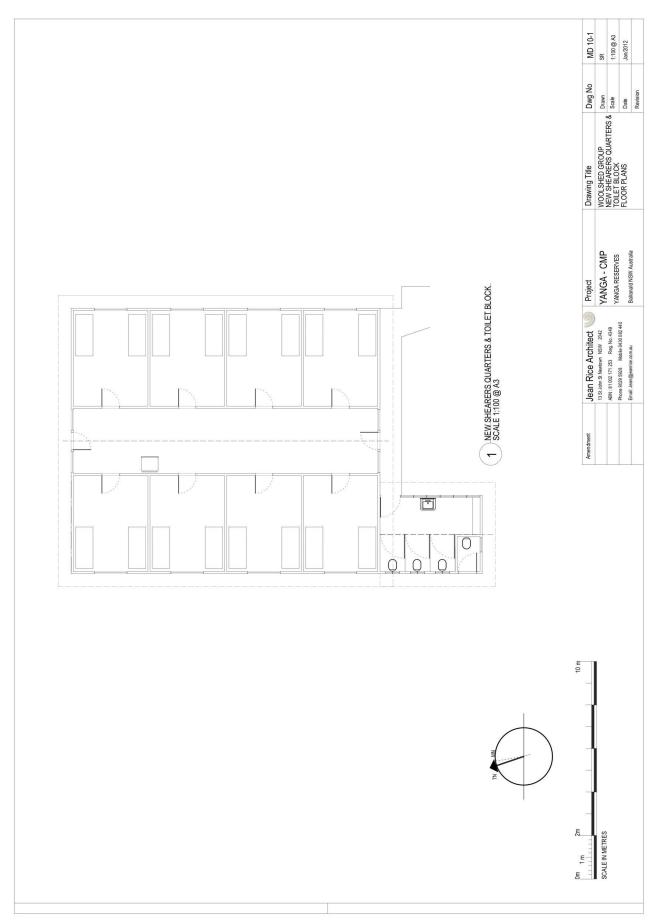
Woolshed Group New Shearers Quarters floor plan. Jean Rice Architect, site assessment 2009.
